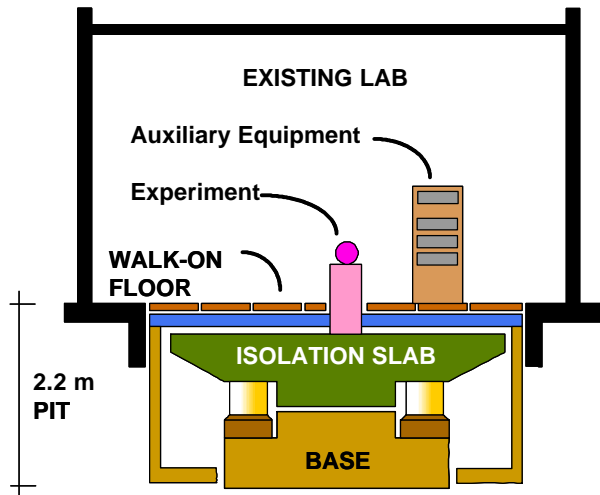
Cross-section of lab and isolation slab show how the airsprings support the concrete slab, while the walk-on floor rests on the walls of the pit. (Drawing courtesy HDR, Inc.)
